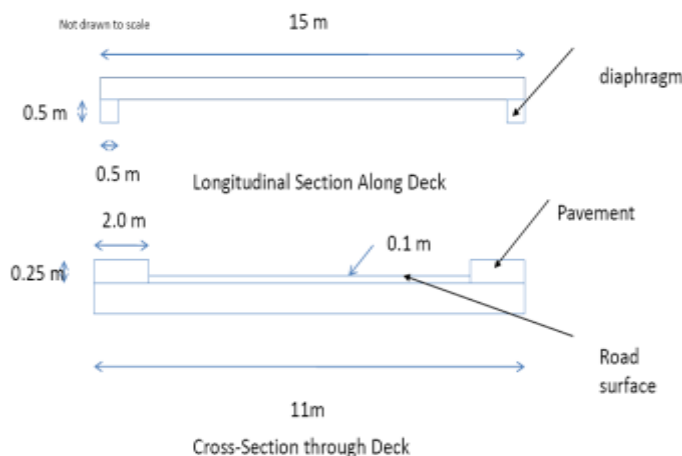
Shows longitudinal section along deck and cross-section through deck.
